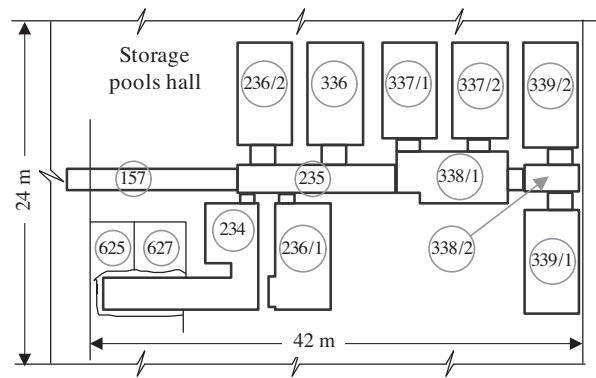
Layout of buildings in storage pools hall of Ignalina NPP Unit 2.
